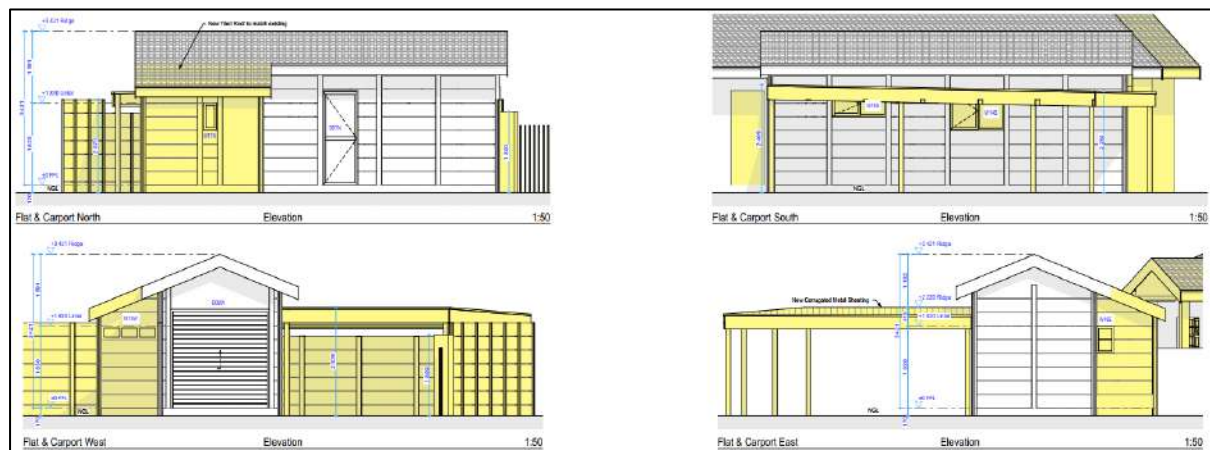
All relevant elevations of the outbuilding which encroaches the street and side building line.
